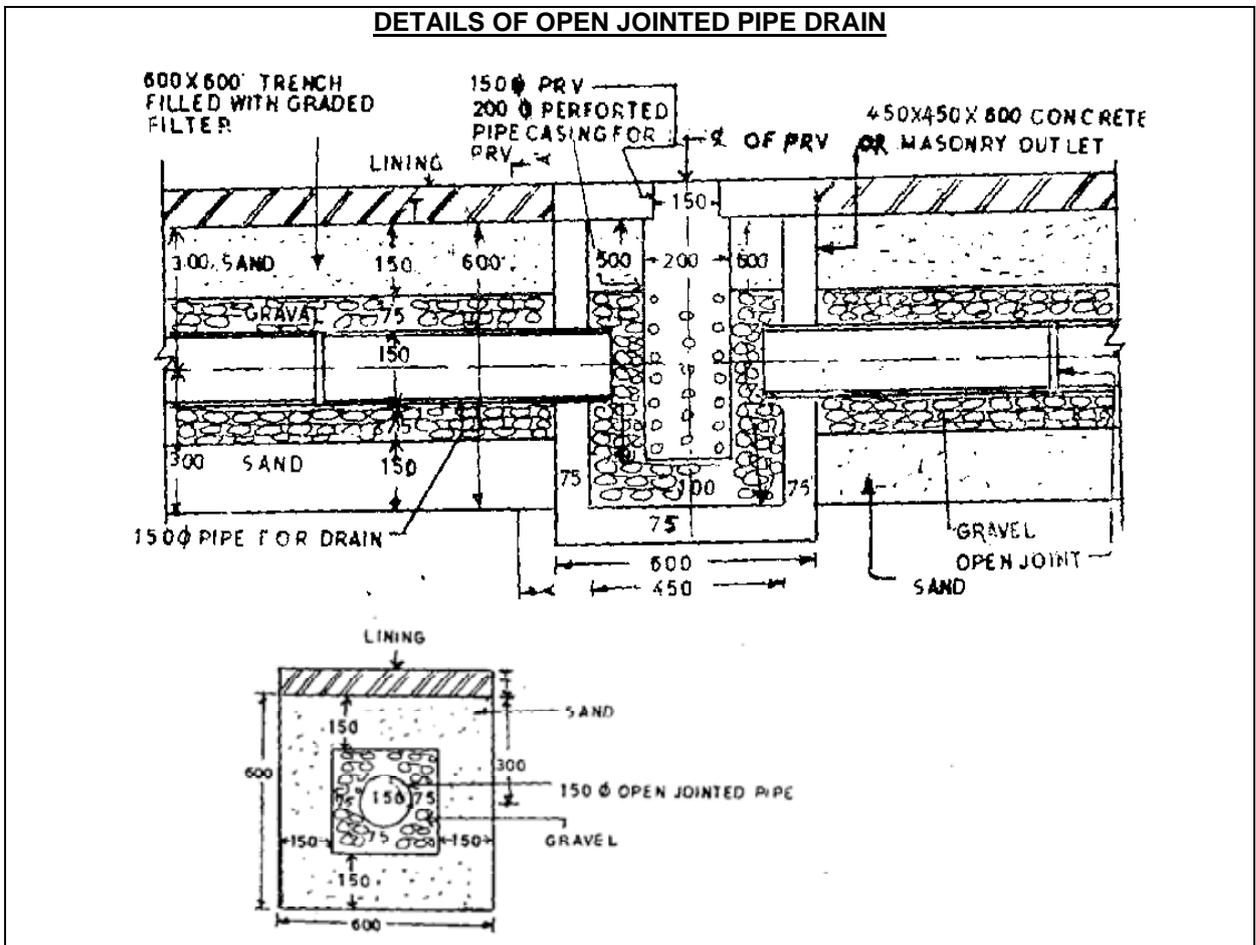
DETAILS OF OPEN JOINTED PIPE DRAIN
